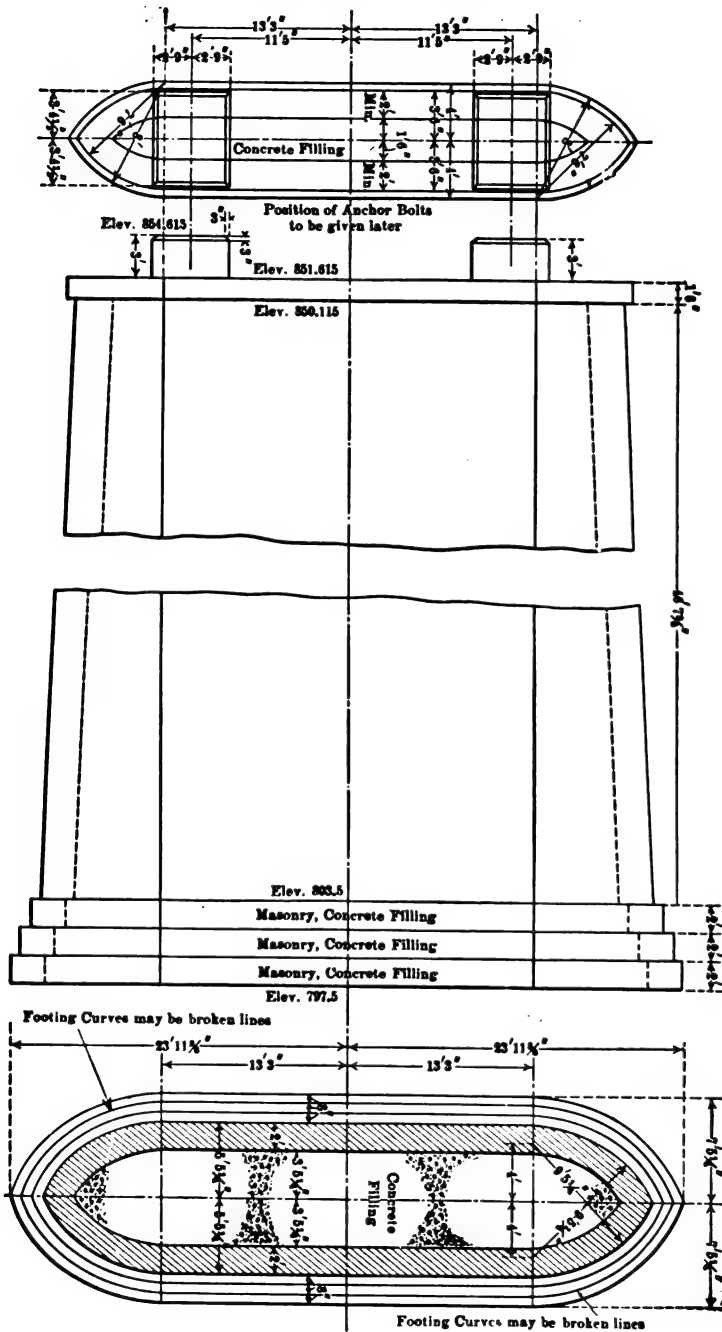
PIERS OF KNOXVILLE CANTILEVER BRIDGE.
